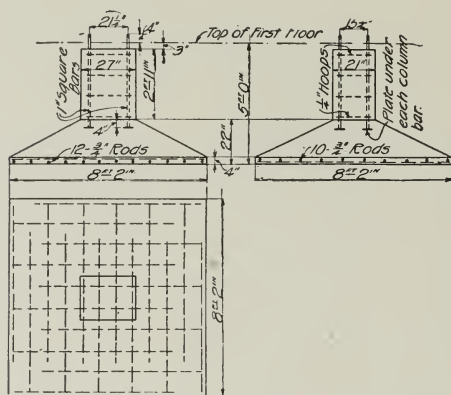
Column and Footing Reinforcement, Bullock Electric Company's Buildings, Norwood, Ohio.
